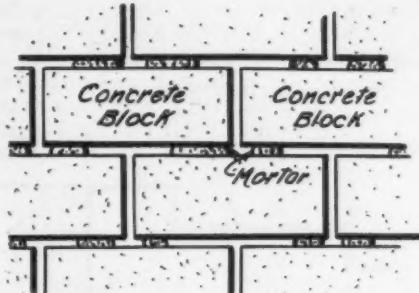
CONCRETE-BLOCK FOUNDATION WALL SHOWING INEFFICIENT USE OF MORTAR.
